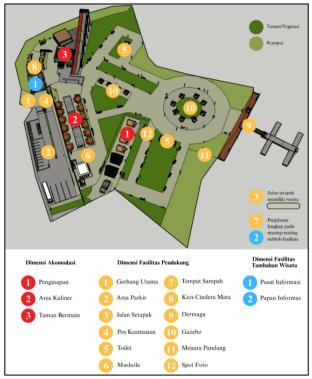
Site Plan Design of Situ Cileunca Tourism Object
